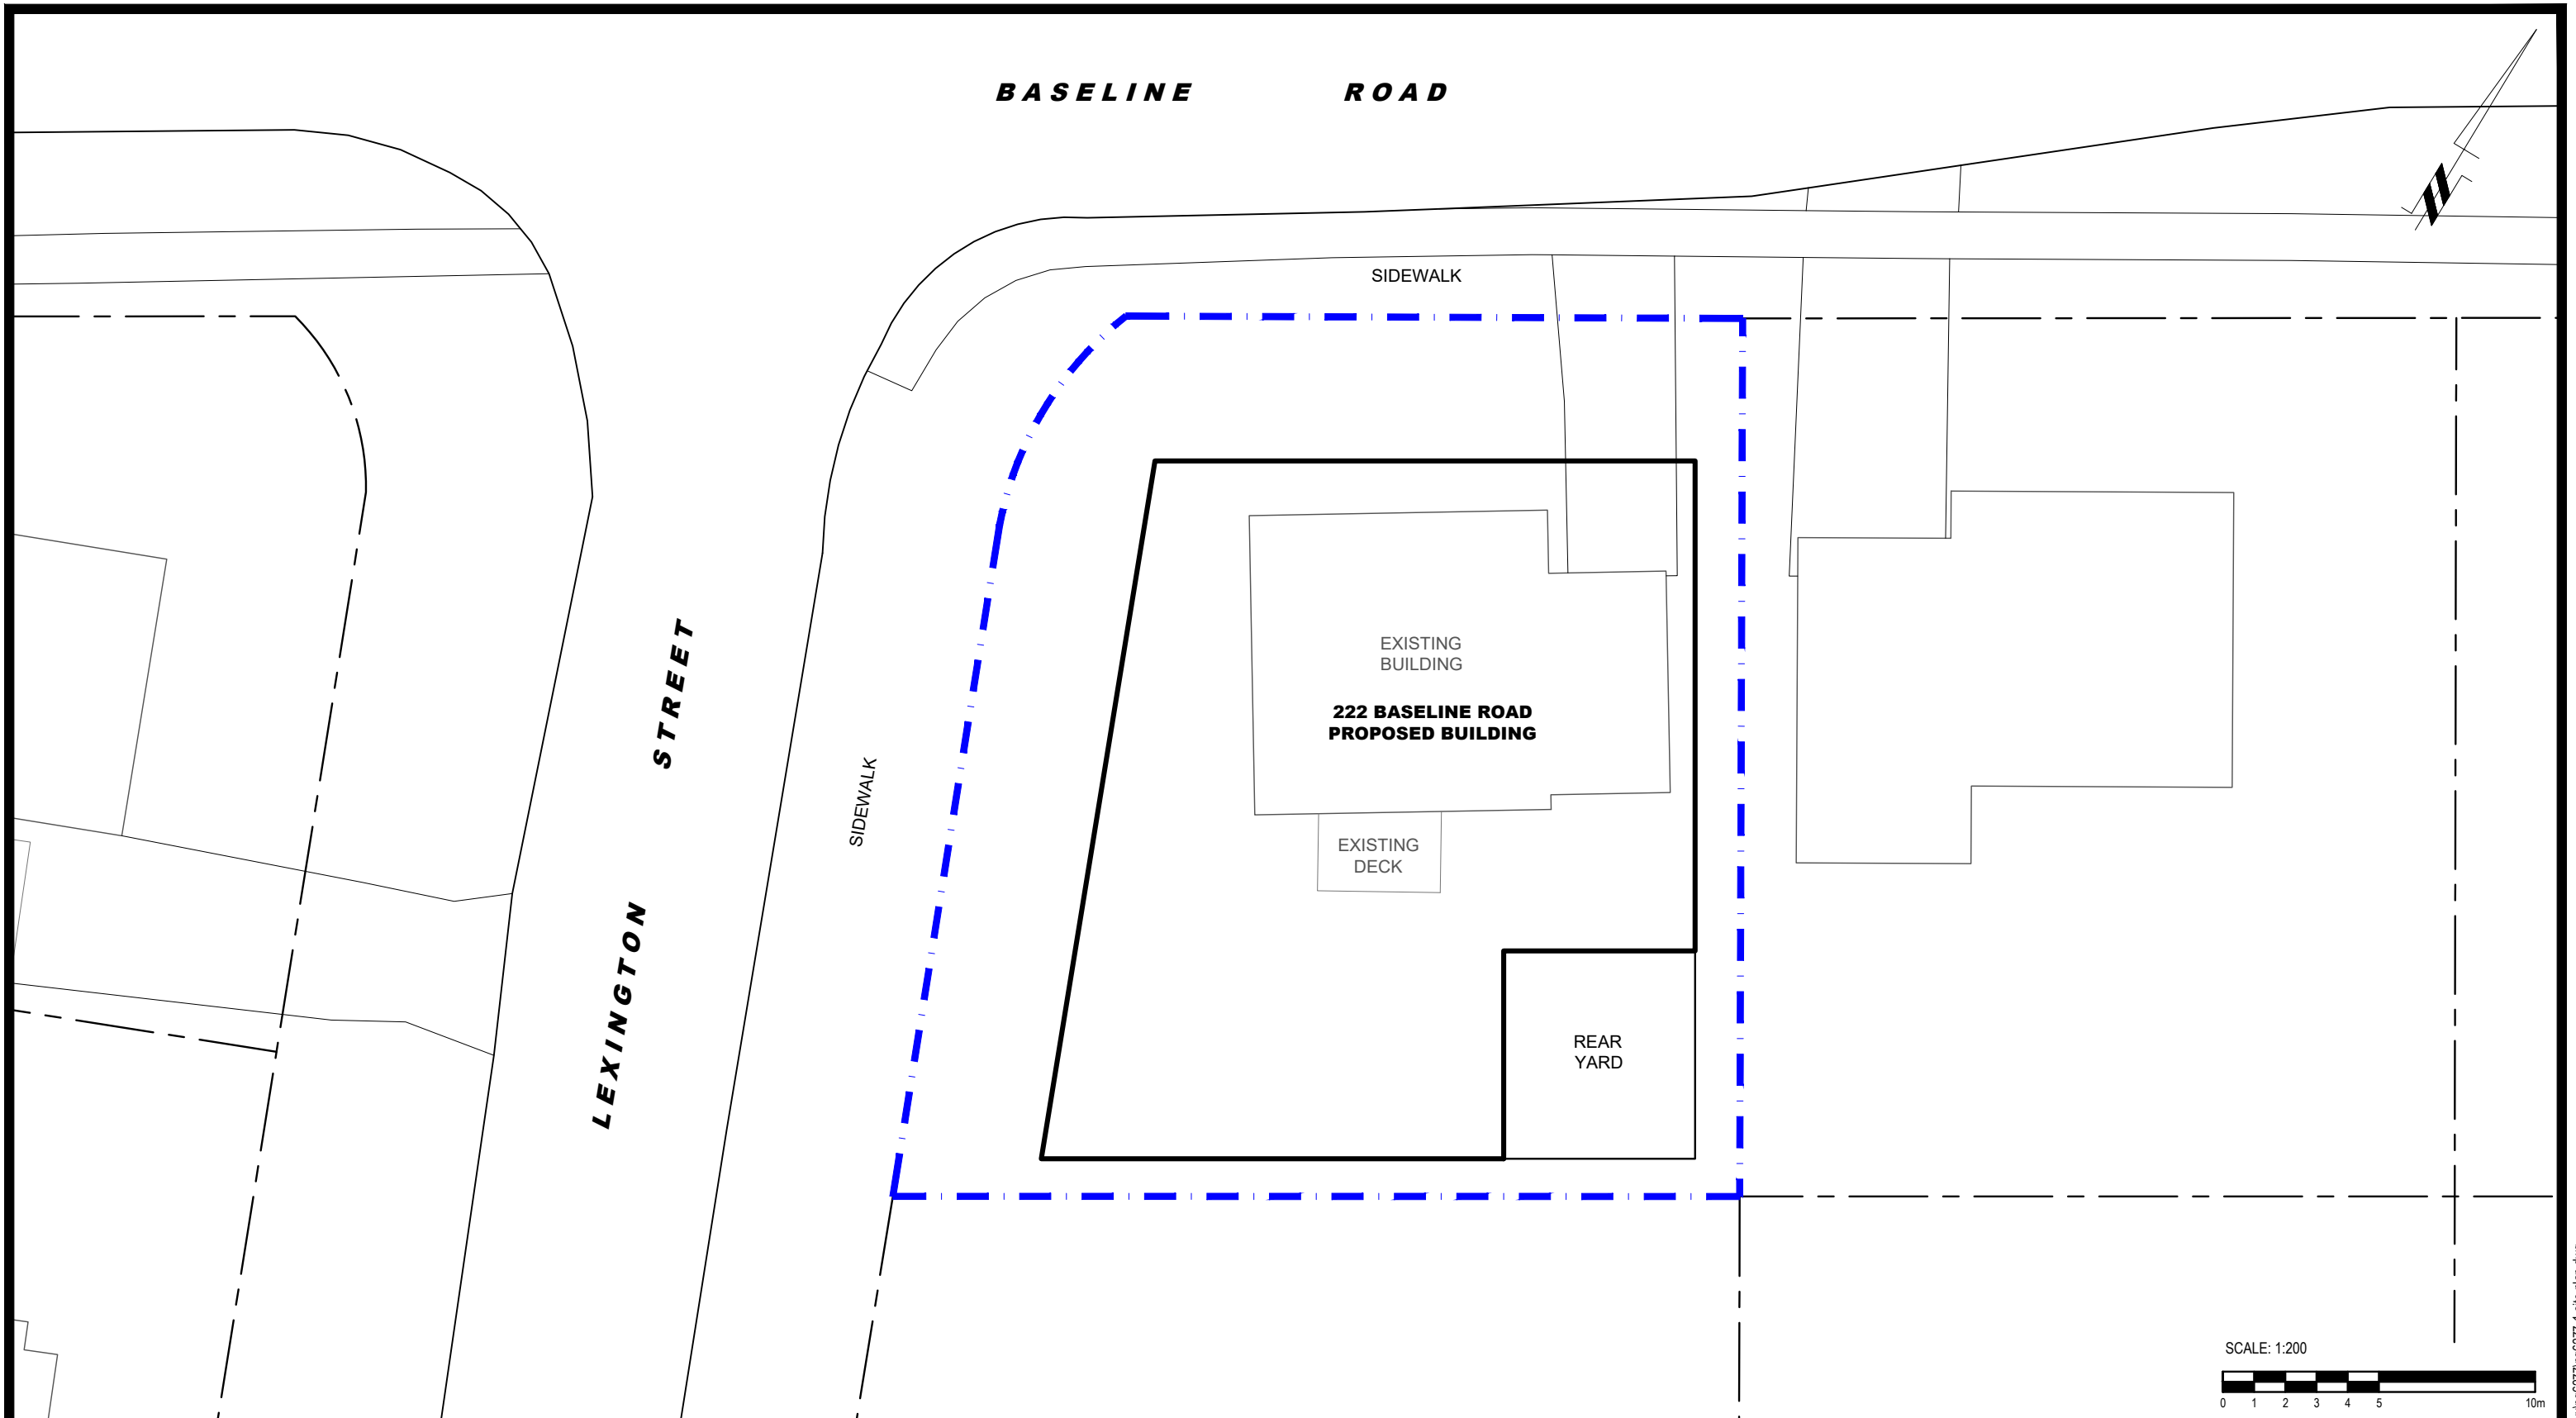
C - Site Geometry (REC 3-1 and REC 3-3)
